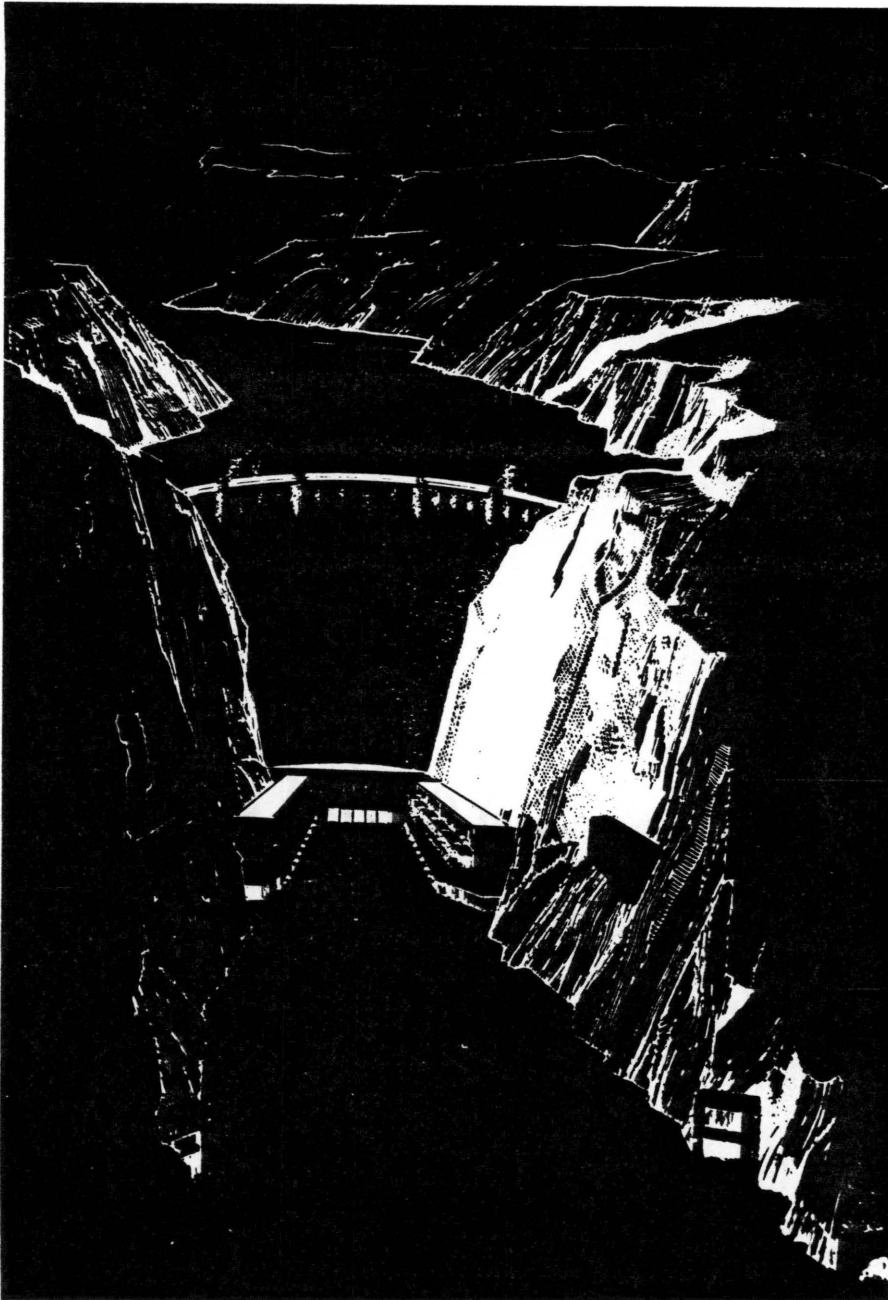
Black Canyon, Colorado: Hoover Dam built 1928-1936. Designed by John Lucien Savage, huge concrete construction is 221.6 m high with its crest length of 360.3 m.
